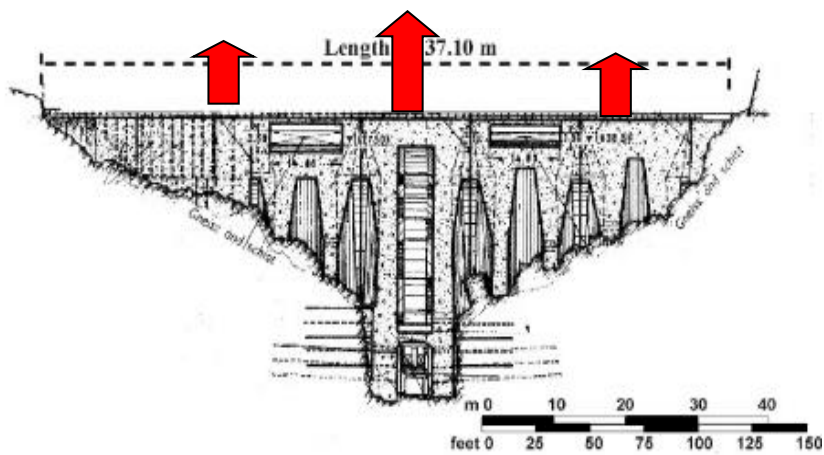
Vertical movements of different concrete blocks of a hollow gravity concrete dam.
